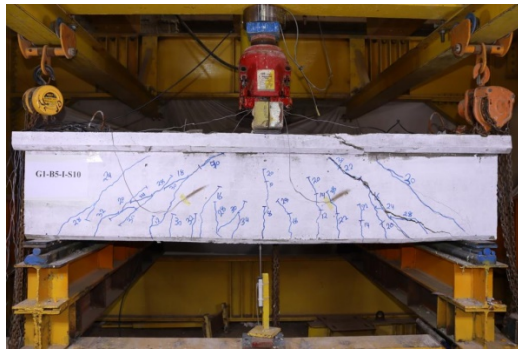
Failure crack pattern of specimen G1-B5-I-S10.
